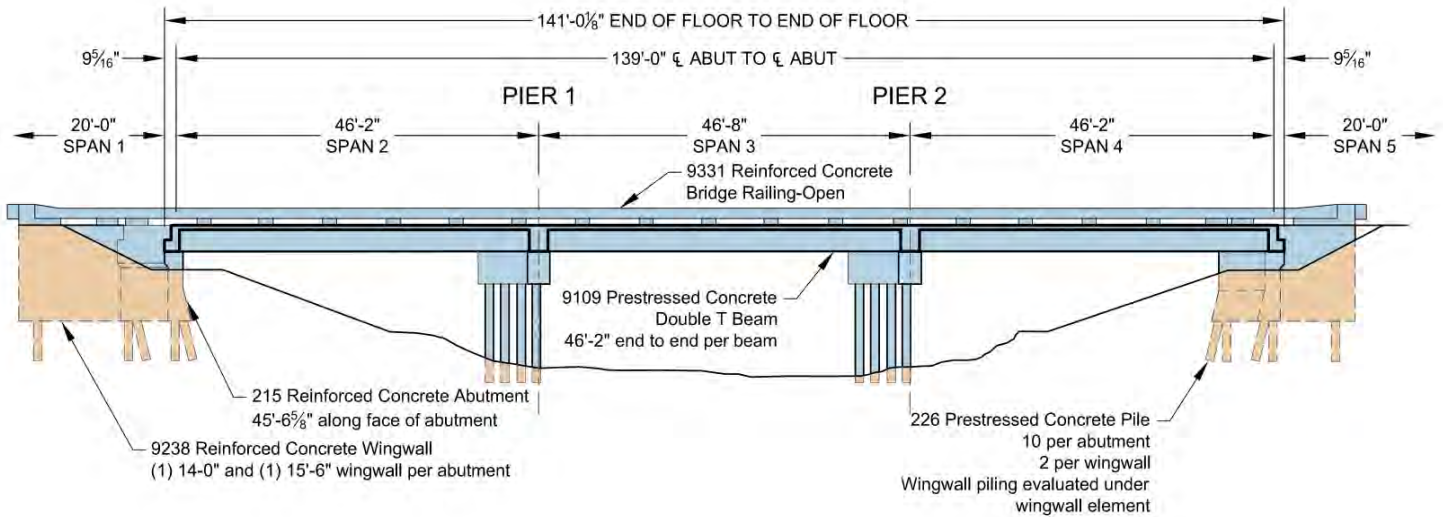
EI.24.7- 1: Elevation view of continuous prestressed concrete Double T Beam bridge
